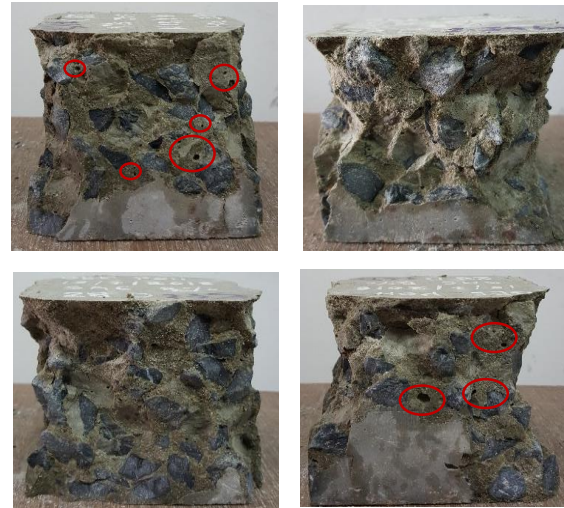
Satisfactory Failure of Specimen Concrete with 8% of Clam Shell Ash as Replacement of OPC
